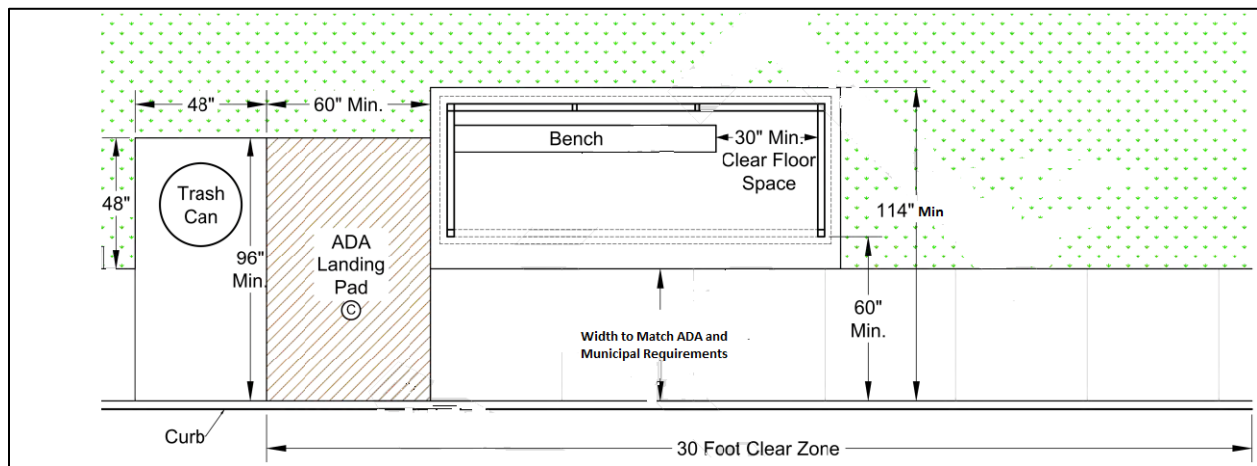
Bus Shelter with Adjacent Sidewalk and ADA Landing Pad Next to Shelter.
